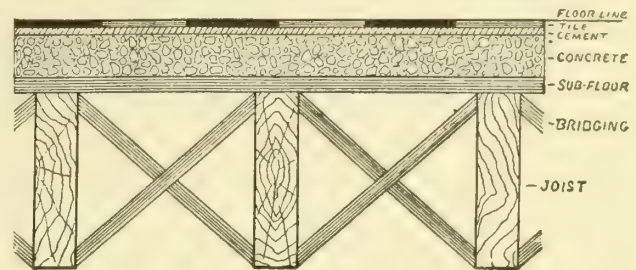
CONSTRUCTION FOR TILE IN NEW BUILDING
